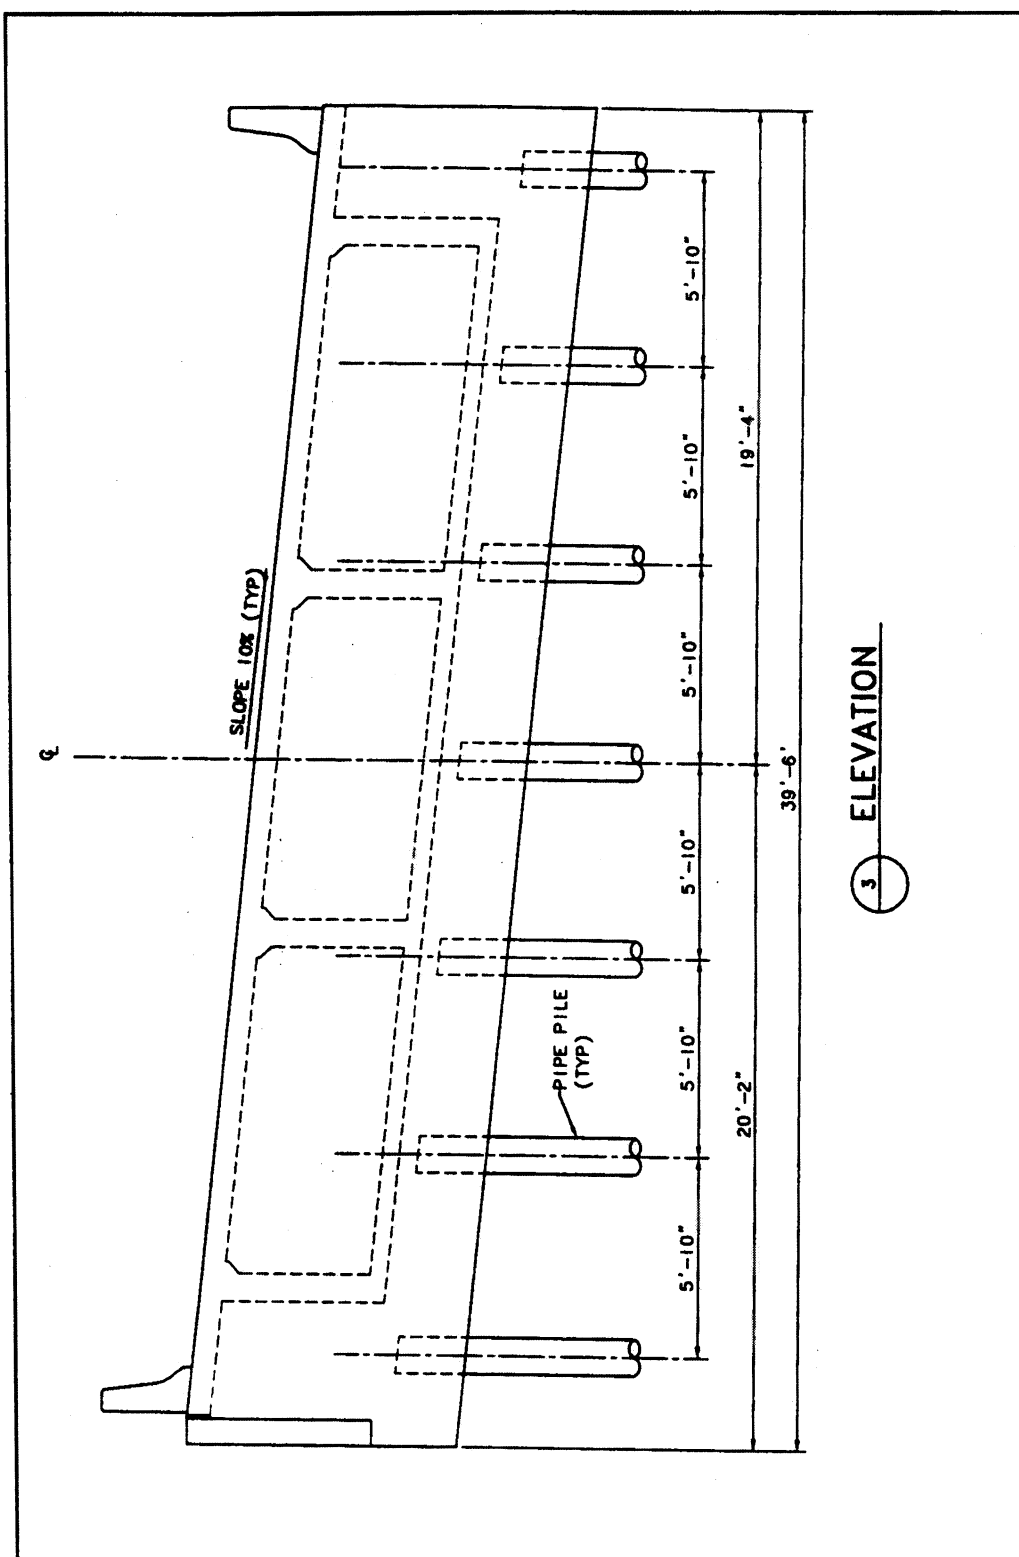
Bridge No. 6 – End Elevation at Abutment
